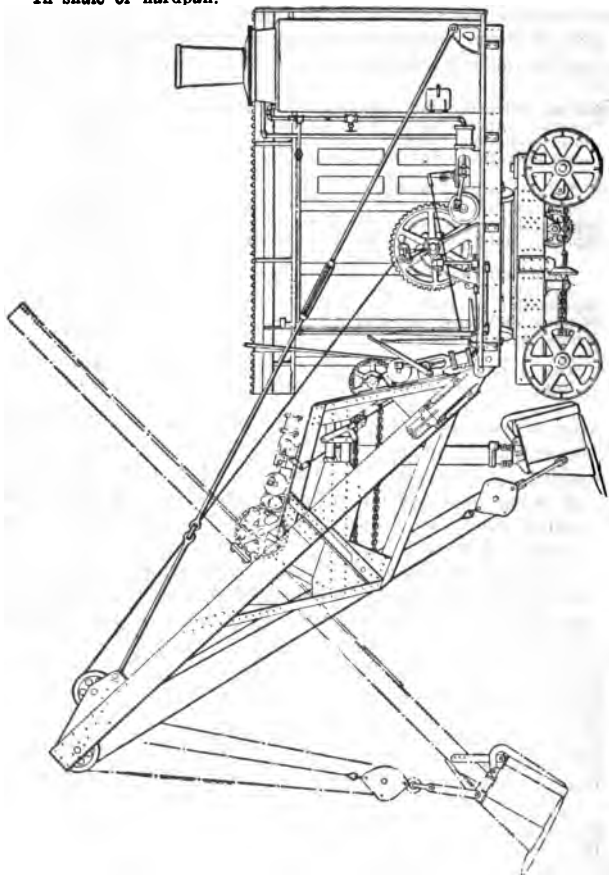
Thew Shovel with Horizontal Crowding Mechanism and Alternate Equipment of Long Dipper Stick.
